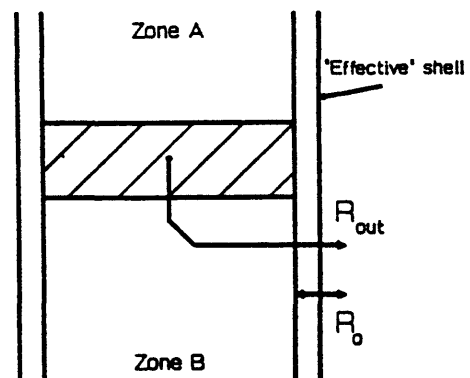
Multi-layered division wall/floor between zones A and B in a well insulated building.
